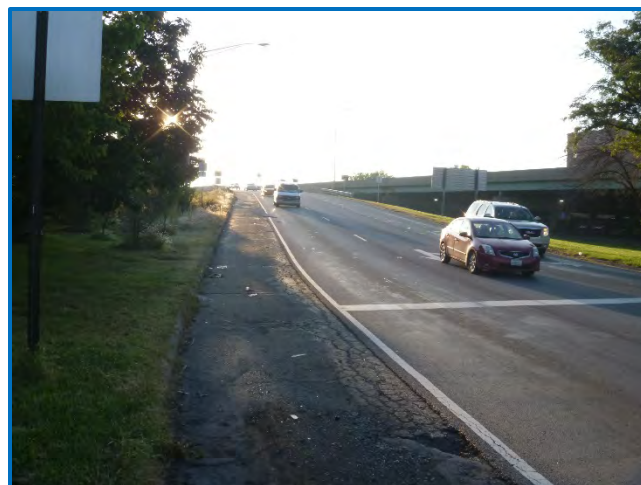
View of the I-65 northbound off-ramp facing southeast (10/3/2015). No water resources were observed in this area.
